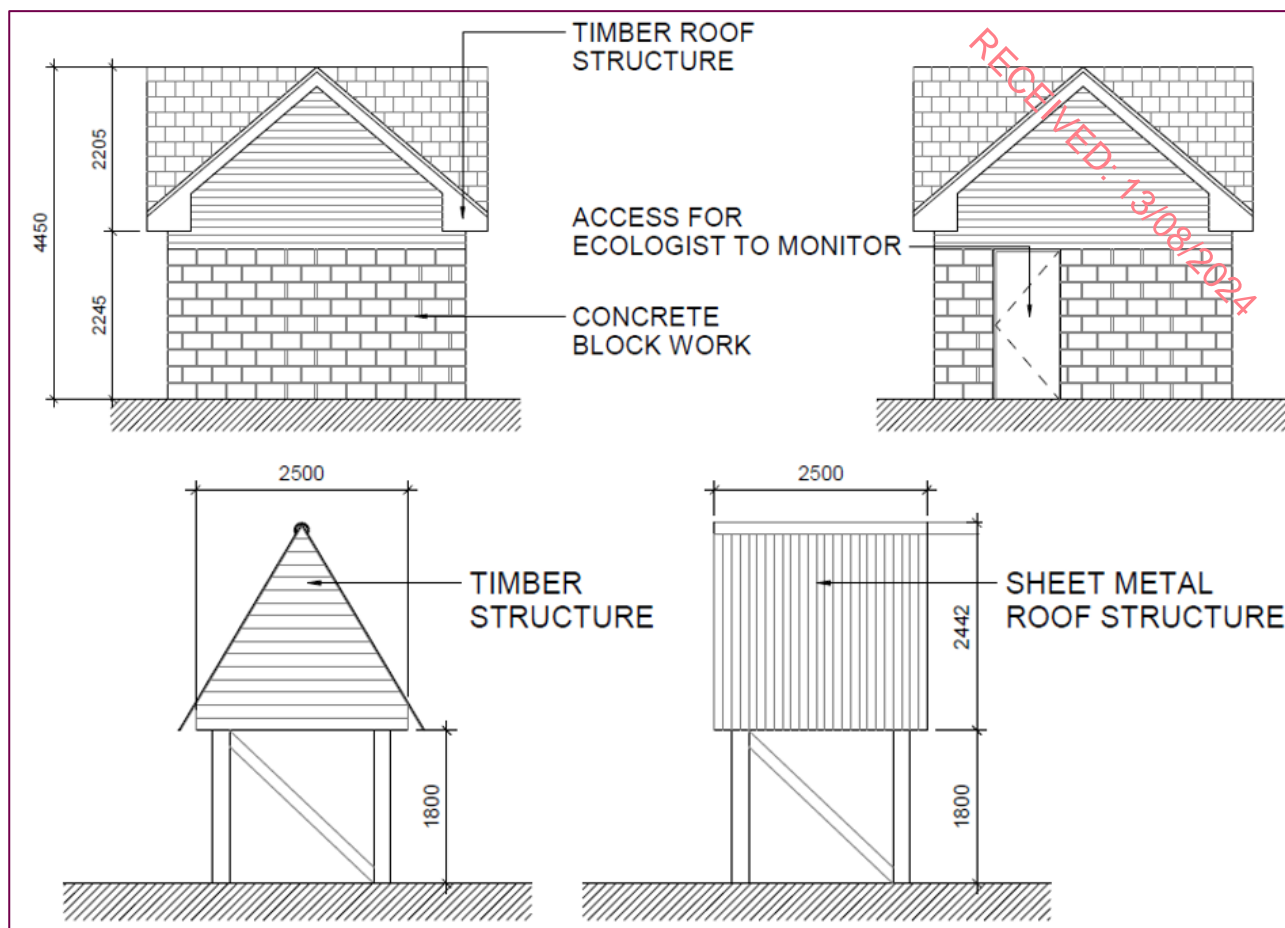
Typical Bat House Designs (Elevations) (Extract from Drawing 22217-RKD-ZZ-ZZ-DR-A-1402, Volume III)
